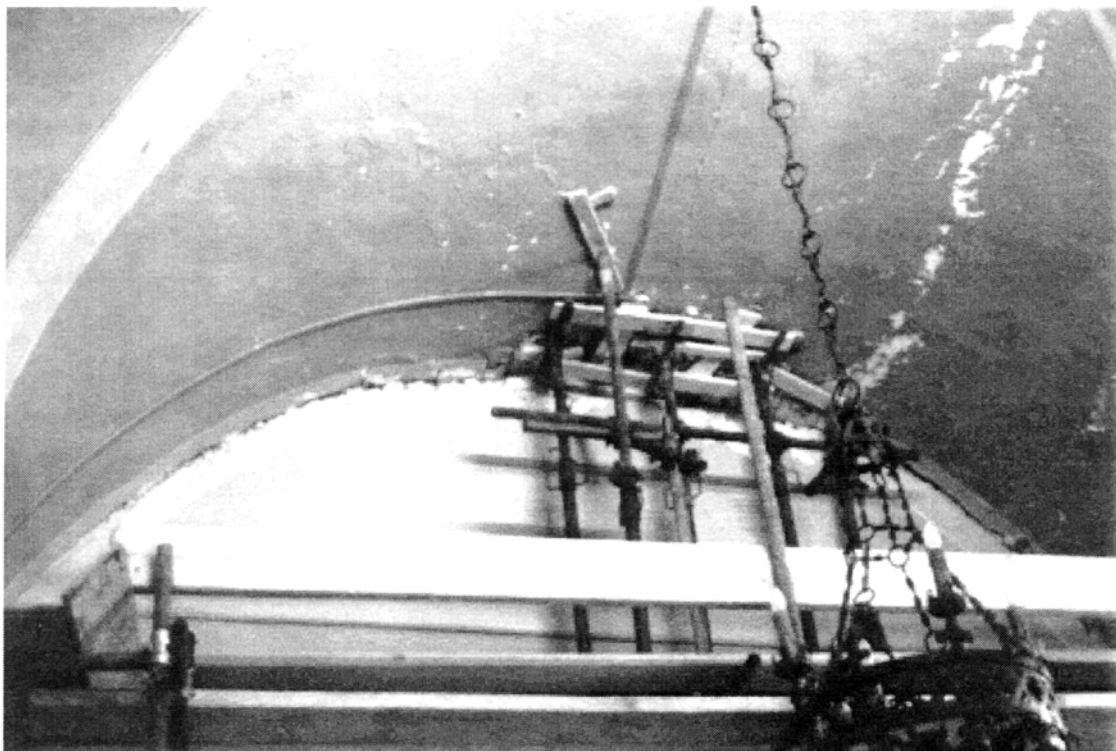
Frati Minori Convent: damage to the vault of the library and shoring
